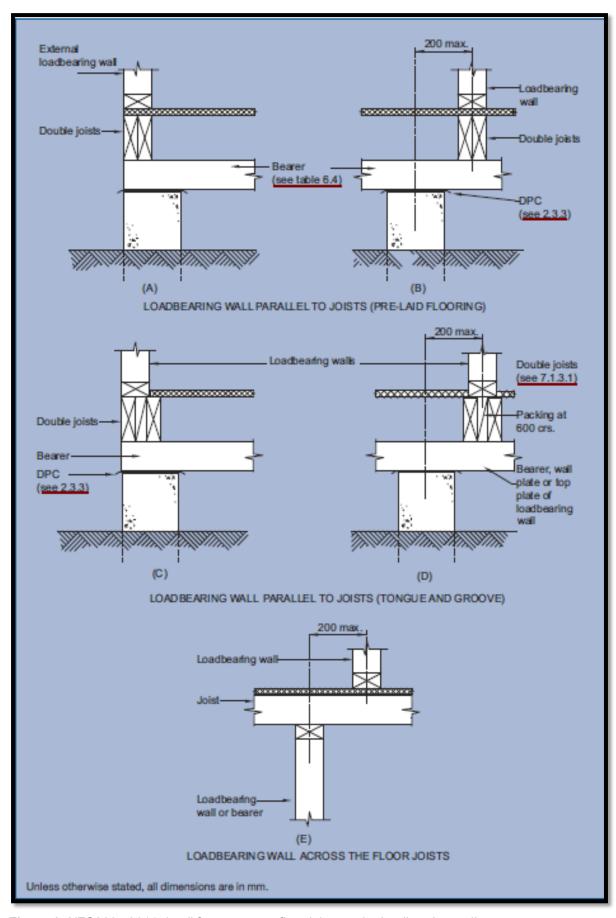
NZS3604:2011 detail for support to floor joists under loadbearing walls
